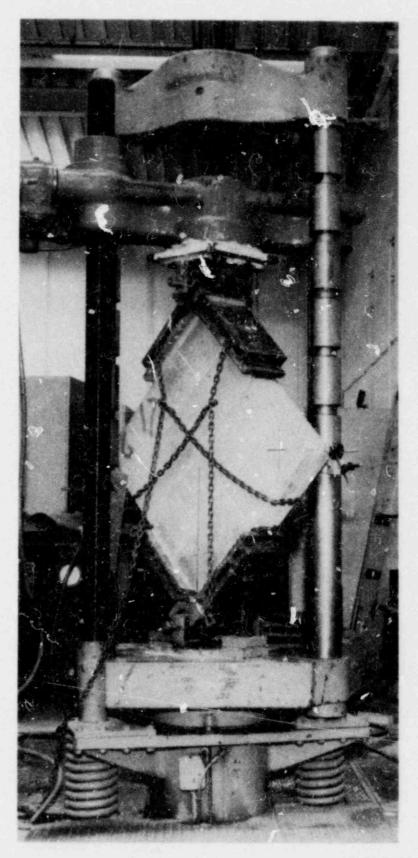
OVERALL VIEW OF MODIFIED DIAGONAL COMPRESSION TEST SETUP
